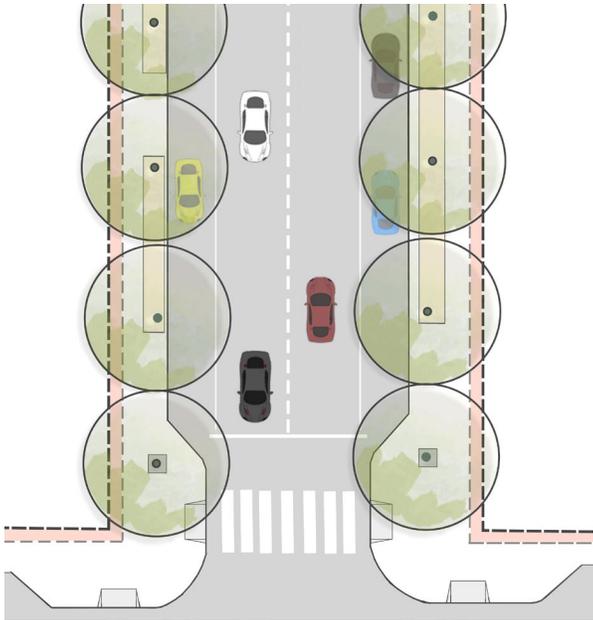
(1). 200 E and 400 E Cross Section and Plan-view
